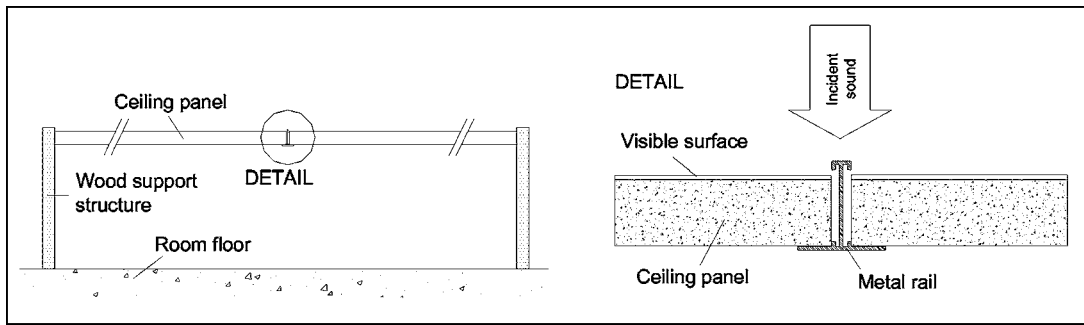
Detail showing the seating of the ceiling panels on the metal railing.
